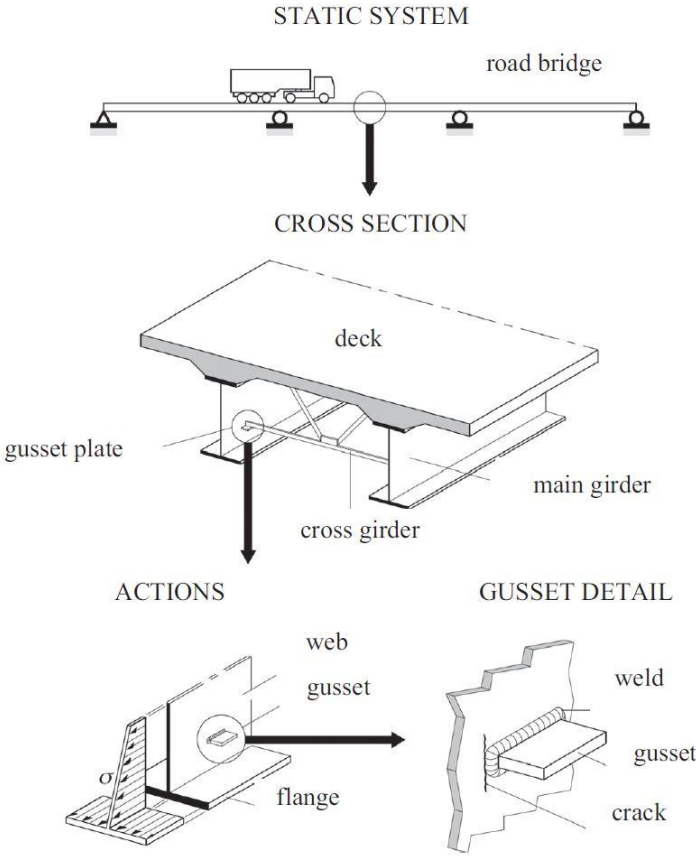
Possible location of a fatigue crack in a road bridge (ECCS, 2011) [3]
